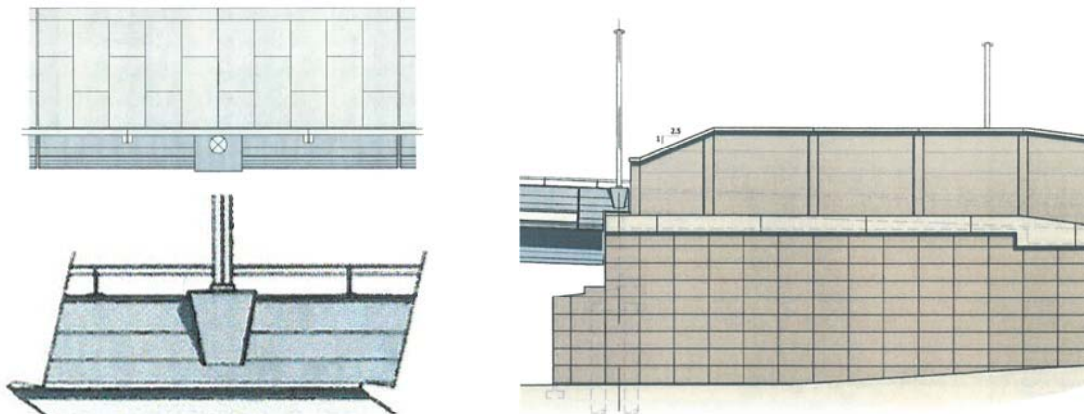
Sidewalk, parapet, retaining wall and noise wall architectural treatments.
